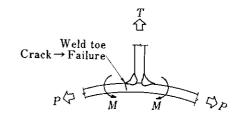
Failure mode of welded "T" connection sheet piles
